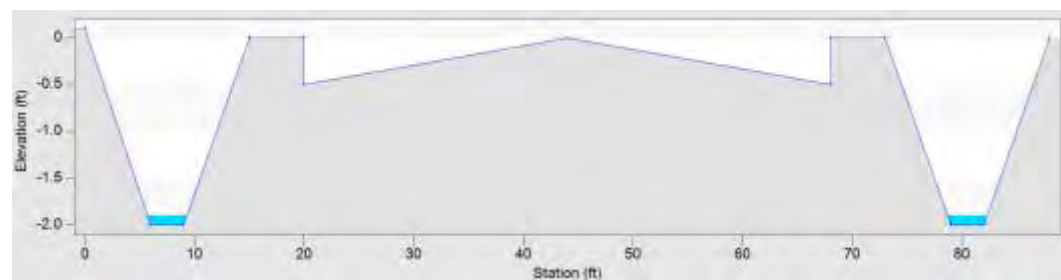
Cross-Section for Modeling Streets with Trapezoidal Ditches
